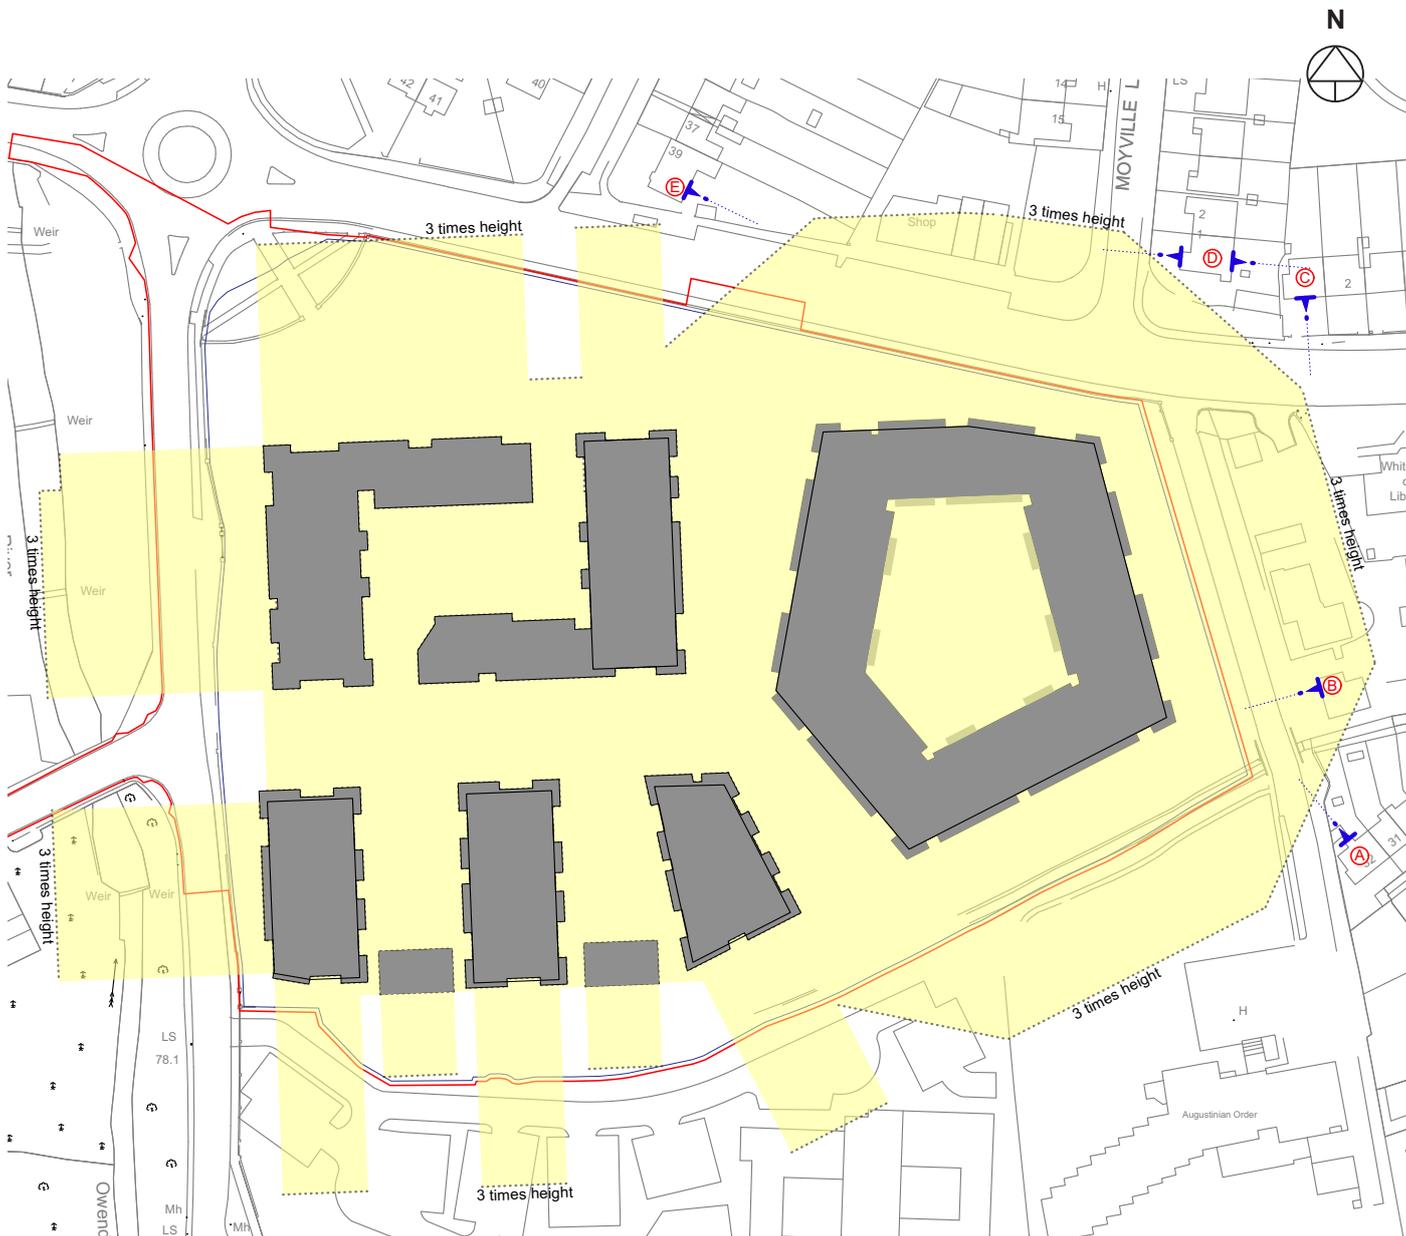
Proposed site plan showing the zone of influence (3 times the height of the proposed building) and direction of the window wall of adjacent residential properties.
